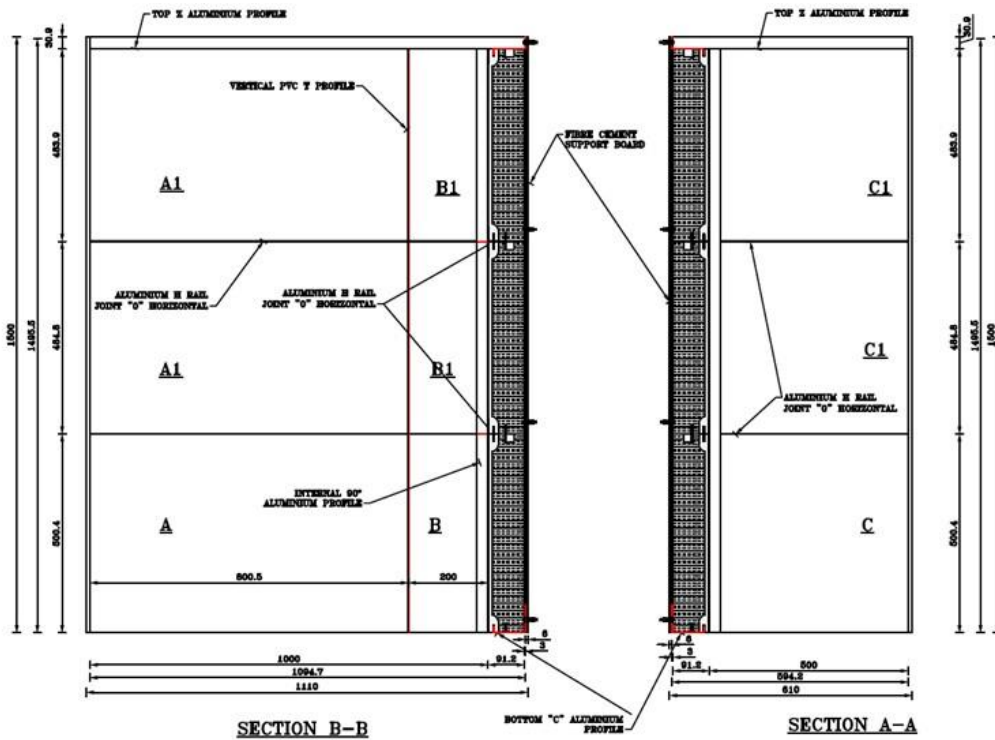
Left side view (long wing/wall) and right side view (short wing/wall) of test bench with module size details according to the EN 13823: 2020 requirements.
